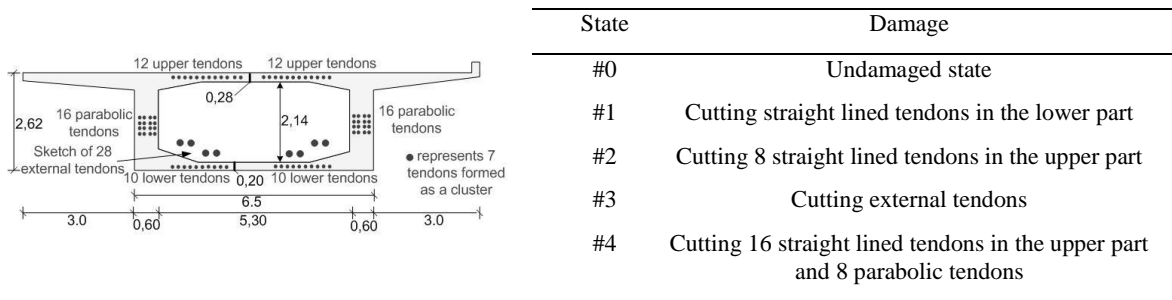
Schematic cross section of the box girder with location of the tendons and the execution of damages in the Champangshiel bridge
